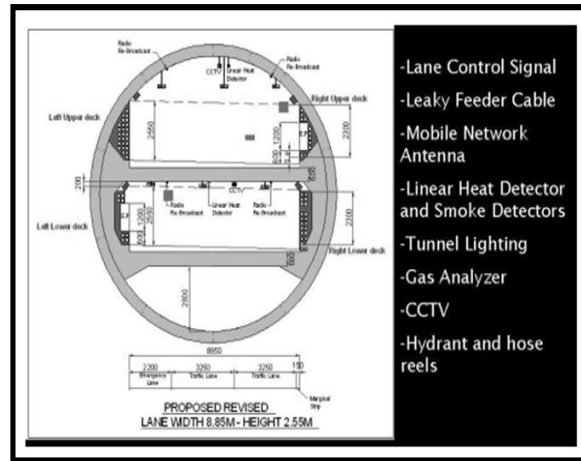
Road Deck Configuration in SMART Tunnel with E&M Equipment indicated
